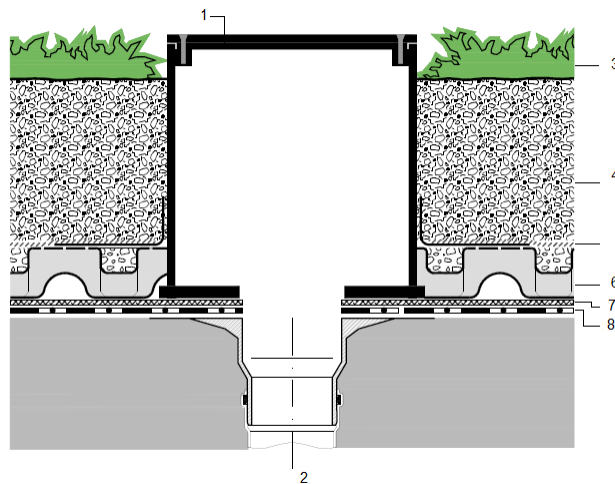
1. Inspection Chamber /drainage box.2. Roof outlet.3. Lawn, perennials, shrubs and small trees.4. System Substrate .5. Filter Sheet .6. Drainage Element .7. Protection, Material .8. Roof construction with root-resistant waterproofing.
